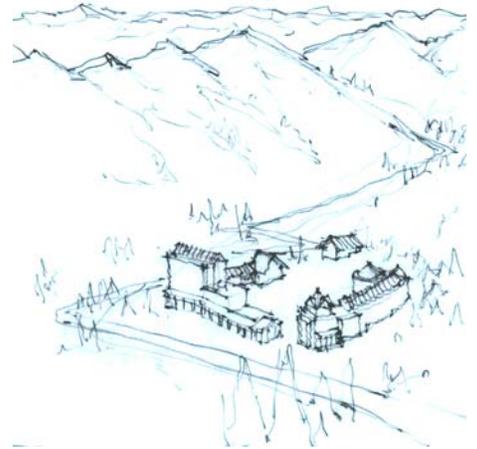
The mass of a single building or group of building shall be organized so that it appears to be an arrangement of smaller-scale, connected structures comprised of simple building forms.
